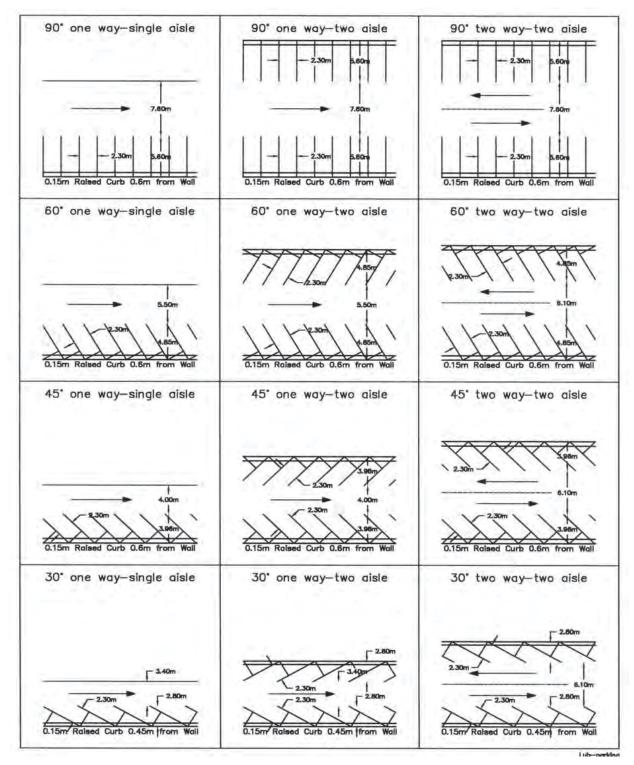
Small Car Parking Stall and Drive Aisle Requirements
